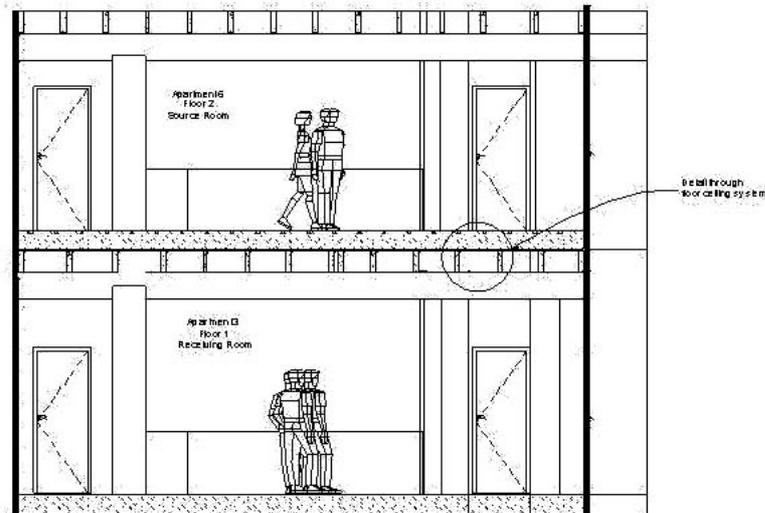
CROSS SECTION THROUGH STRUCTURE
